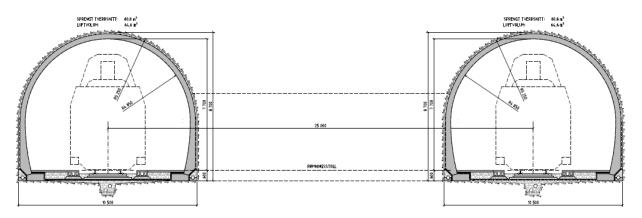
Proposed tunnel design for the HSR link for tunnels excavated by drill and blast method. Total cross-sectional area is 80.8 m^2 and distance from track to track 25 m (Sweco 2011).
